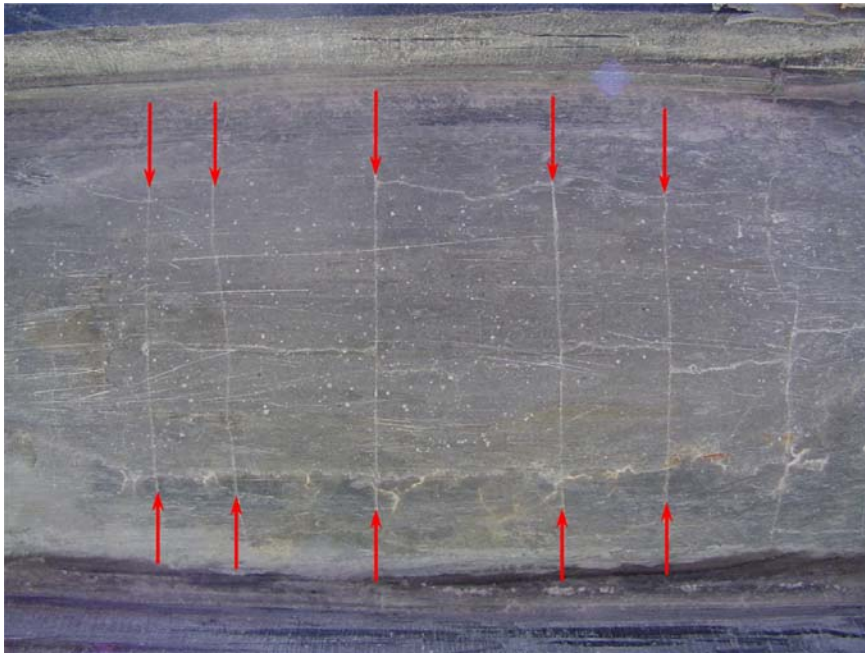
Grout Surface Defect and Corrosion on Helix – Specimen #1
